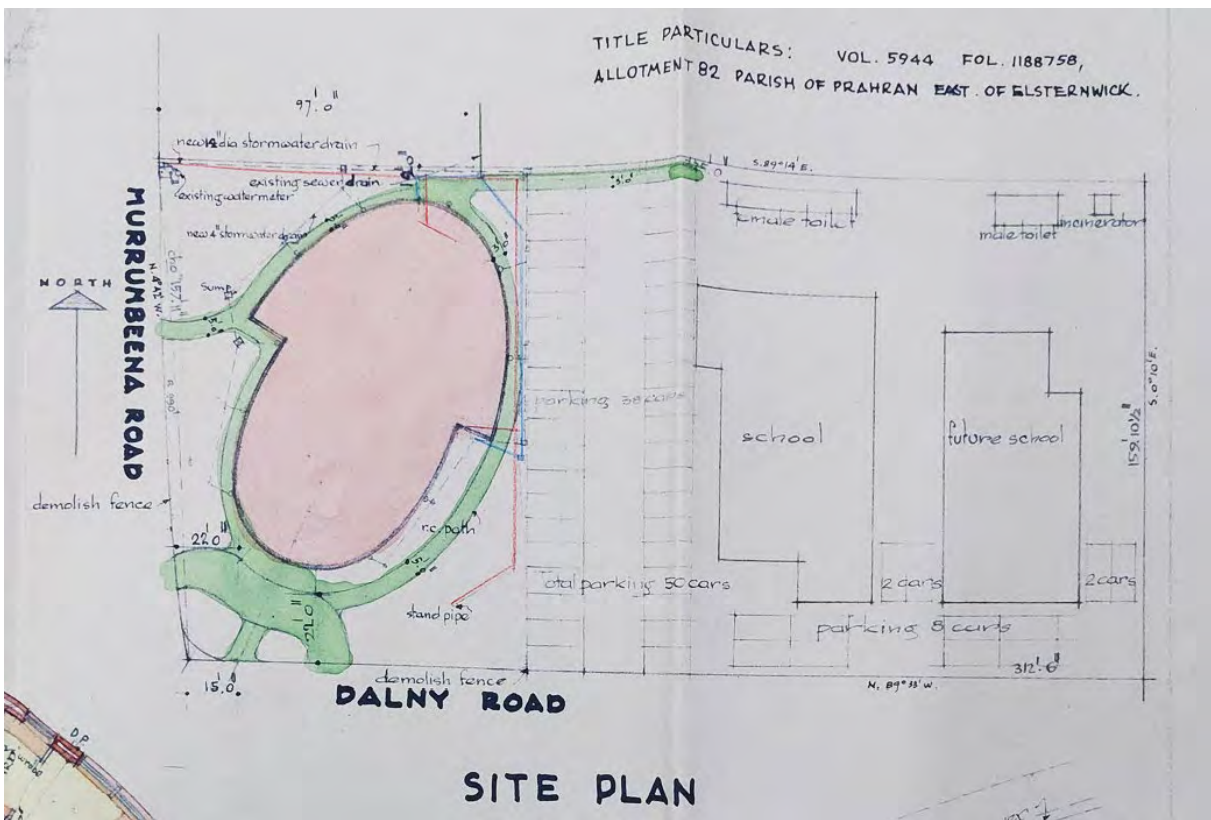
Site plan showing the proposed church to the west of the school buildings, July 1962 (Source: PROV, PB File)
